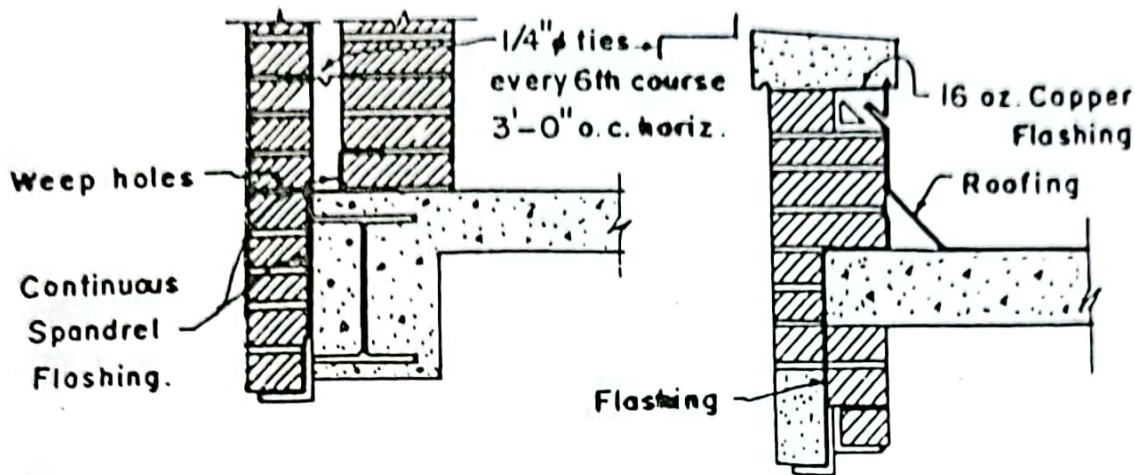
CAVITY WALL LOW PARAPET FLASHING
